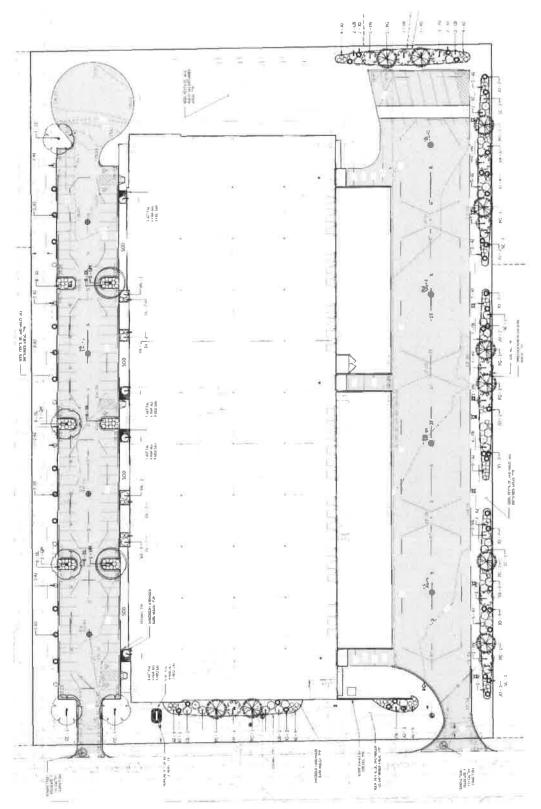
EXHIBIT A CONT'D: APPROVED SITE PLAN (ENLARGED)
